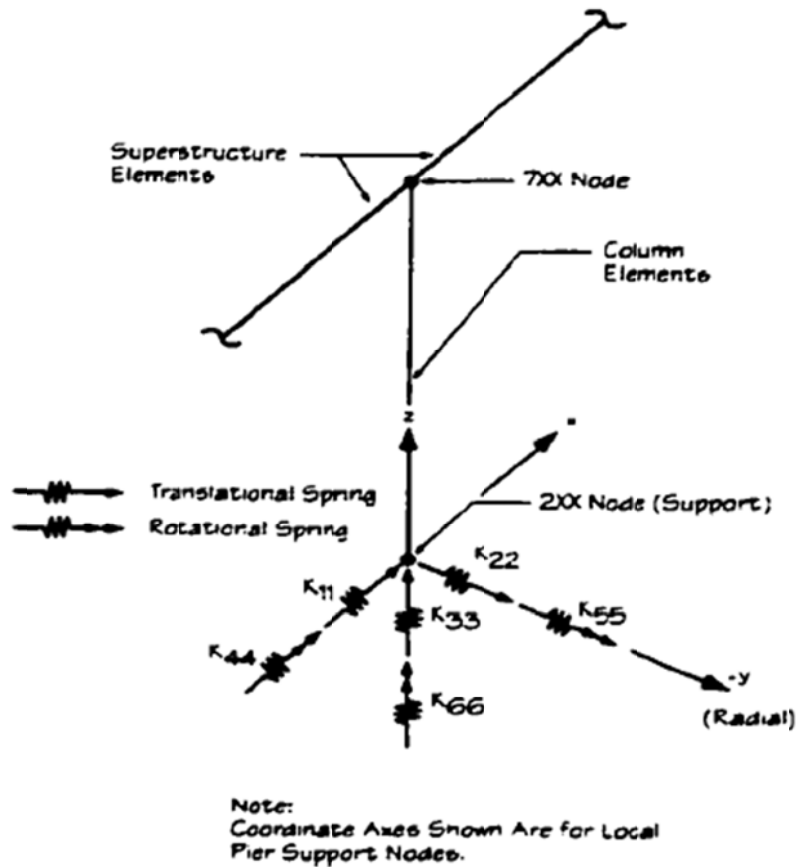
Bridge No. 1 – Details of Supports for Spring Foundation Model
